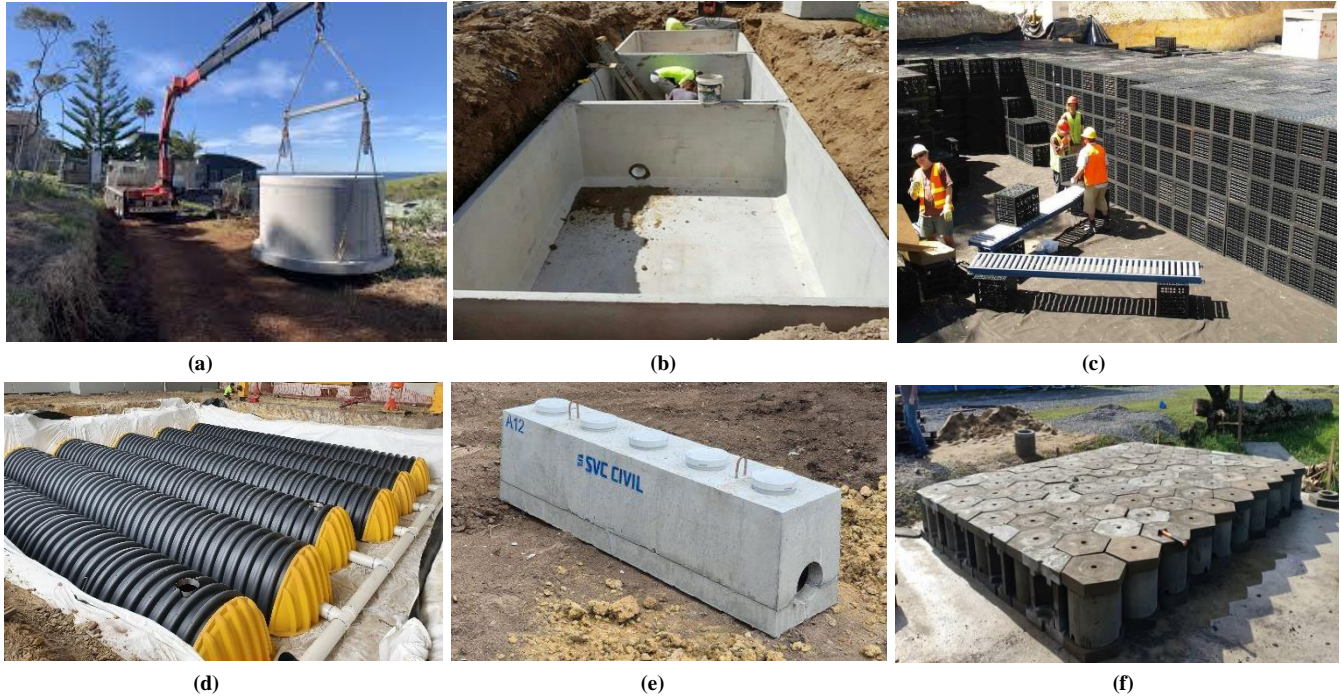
Examples of OSD, (a) Precast concrete tank [5], (b) Precast concrete modular units [6], (c) High-strength plastic modular units [7], (d) Pipe packages [8], (e) Concrete vault [9], and (f) StormPav modular units.
